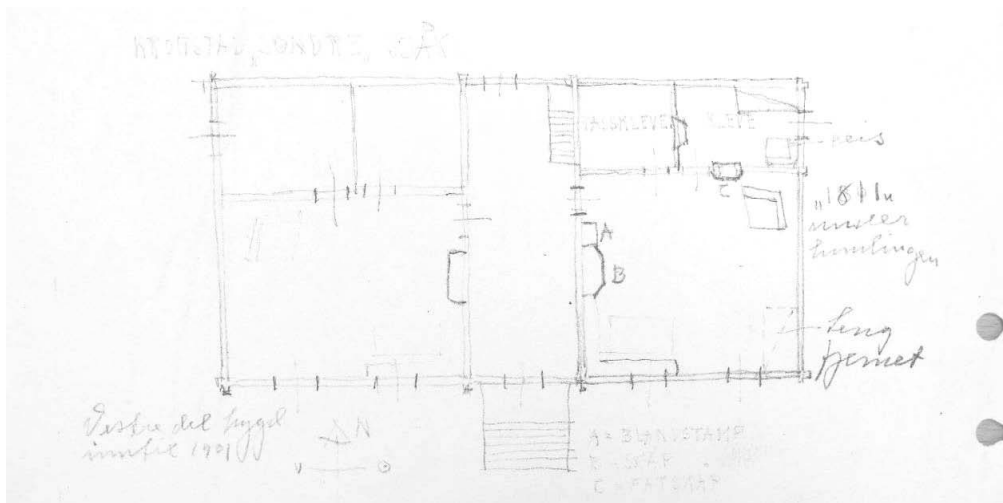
Krogstad, floor plan of the building before relocation “Krogstad Søndre, Sjøk” with comments ‘western section added 1901’; “1811” on the ceiling; ‘bed removed’. The western section, also a traditional three-room plan with fixed furnishings, was most likely an older building moved here: in both sitting rooms the cupboard was outlined. Weak pencil sketch by Halvor Vreim, not dated. (©Riksantikvaren)
